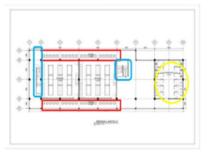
Plan of 2nd floor Covid-19 Islamic boarding school building with AutoCAD
